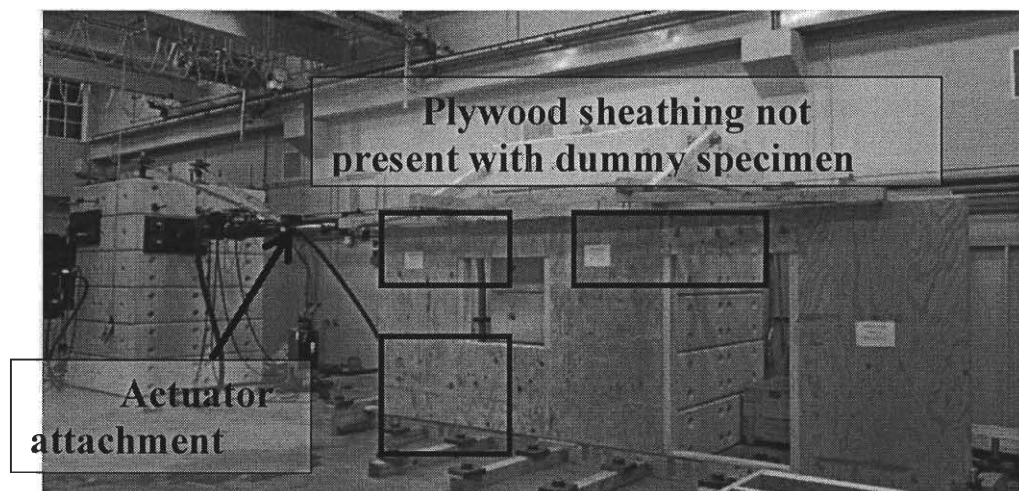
'PD1' Wood Shear Wall Specimen
